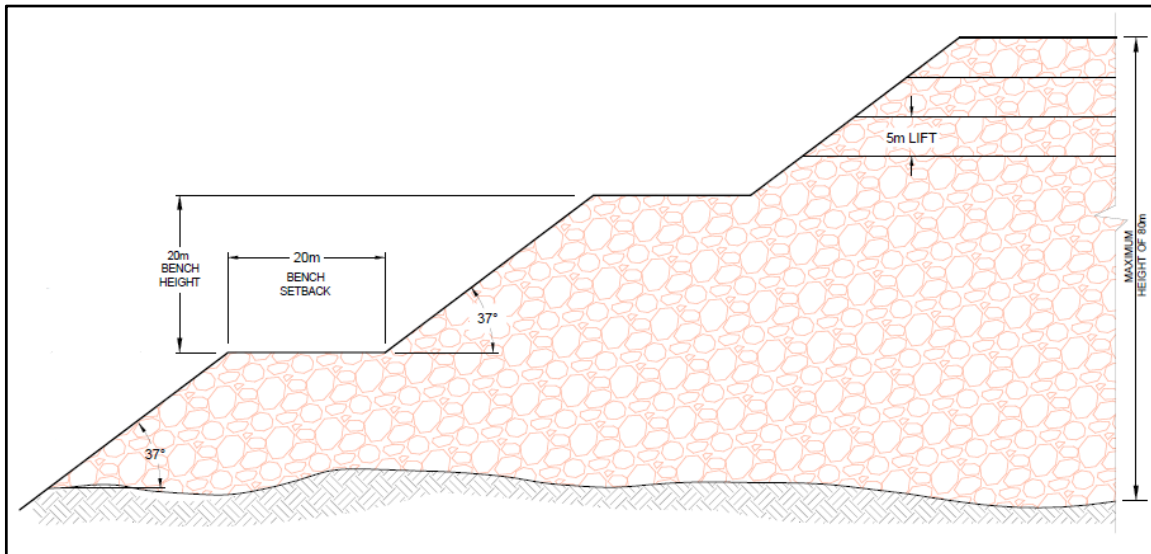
Typical Cross Section of the Whale Tail Waste Rock Storage Facility
